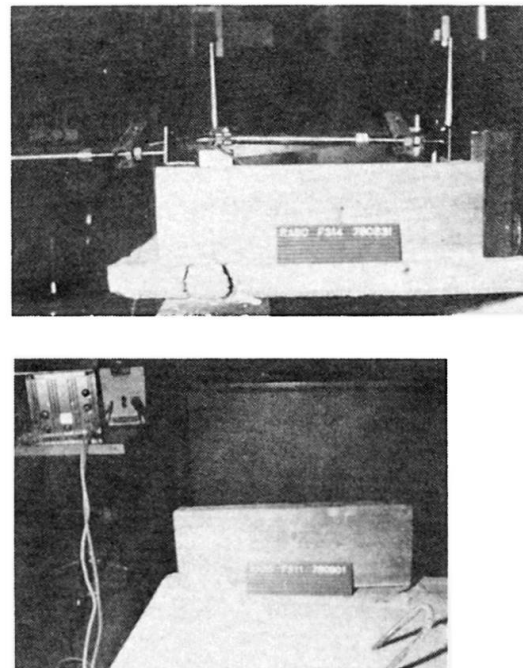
Failure modes in cracking of the end of the concrete plate and shear in the nail-plates, respectively, in the case of end tests
